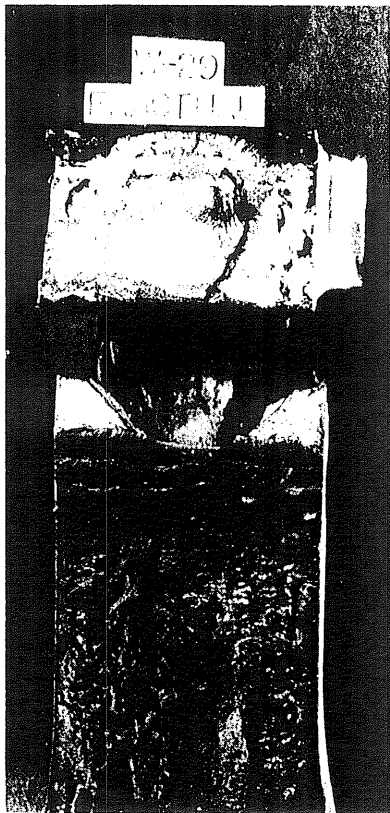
TYPICAL FRACTURE FOR AS-ROLLED PLAIN PLATE SPECIMENS.
